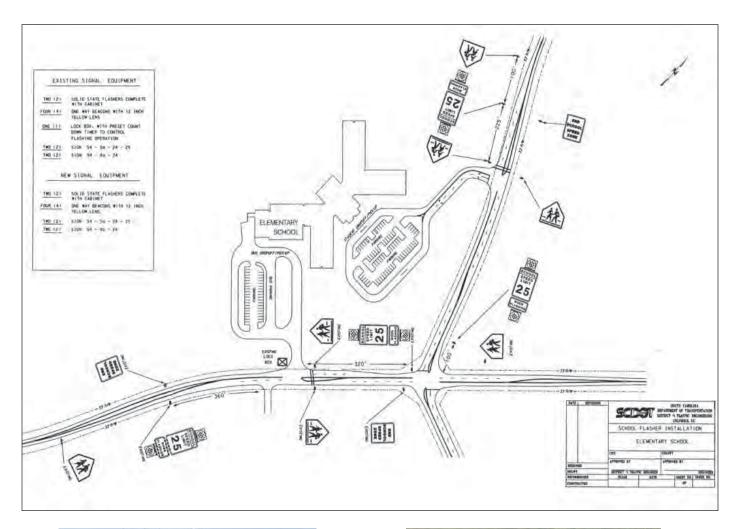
School Zone Flasher - Shoulder Mounted Beacons
